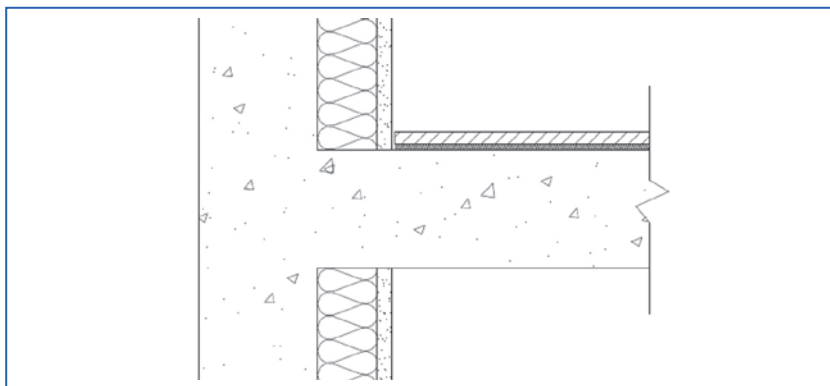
Detail showing a typical separating floor between dwellings with thermal insulation traditionally on the inside.
